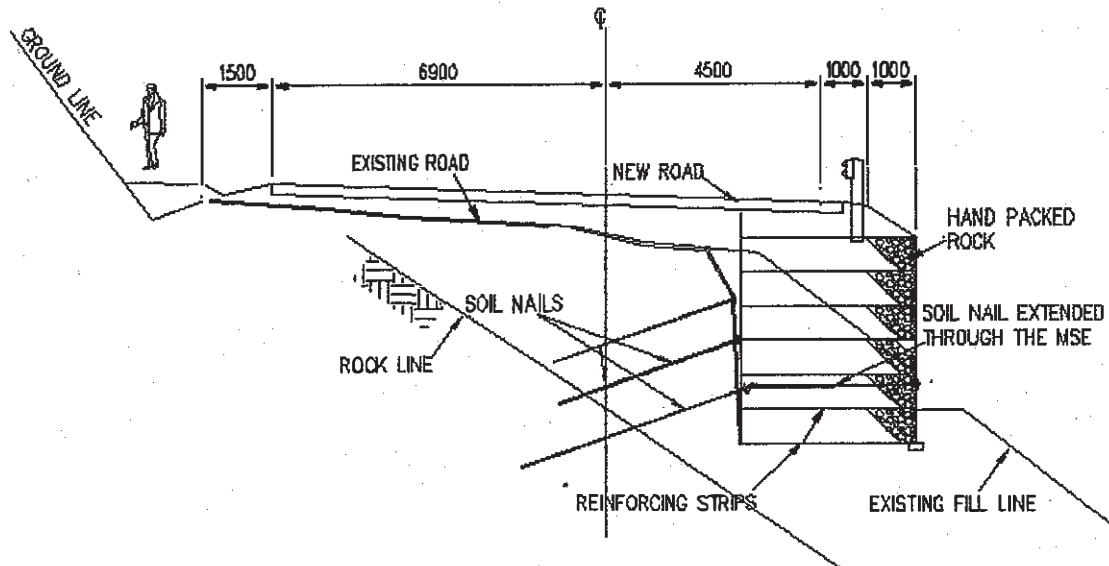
Typical cross section of the composite soil nail / MSE structure.
